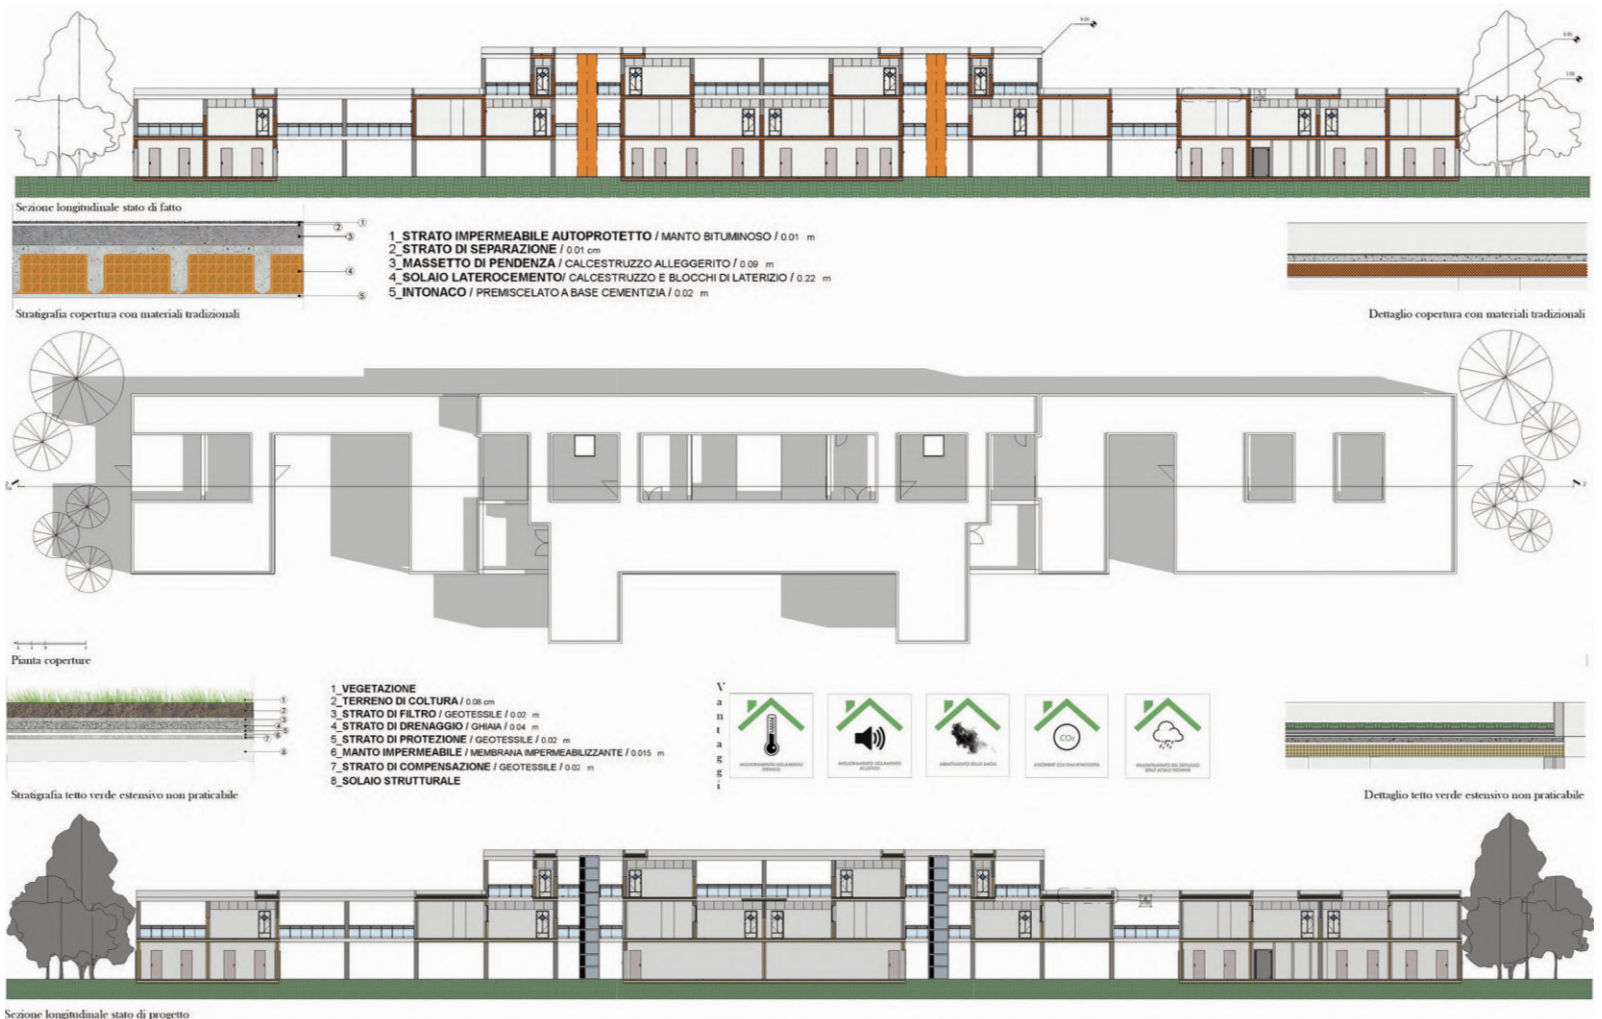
Roof plan and vertical sections: comparison between traditional and innovative materials from BIM platform (credit: R. Russo).
